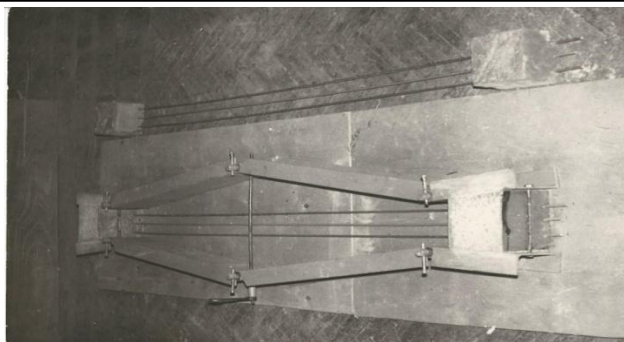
Experimental setup for creating prestressed concrete beams reinforced BPA
